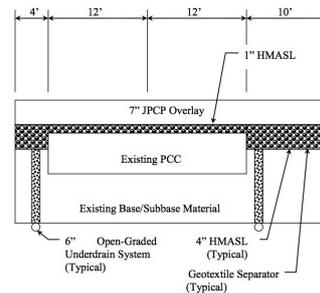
New Overlay Drainage System: Thickened Shoulder Design with Open-Graded Underdrains (depending on soil conditions).
